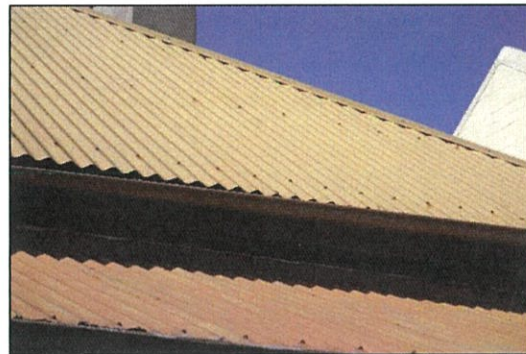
Roof plan to northern elevation, with skillion verandah roof in the foreground.
